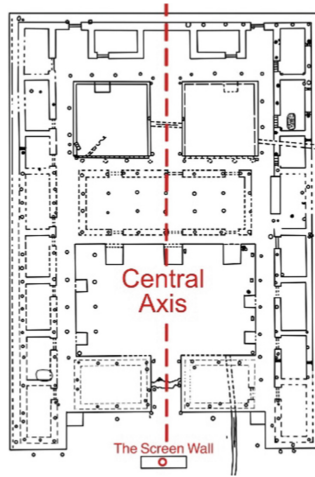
Plan of the Western Zhou building site (Photo credit: Briefing on the Excavation of the Western Zhou Building Site in Fengchu Village, Qishan, Shaanxi. Redrawn by author)
